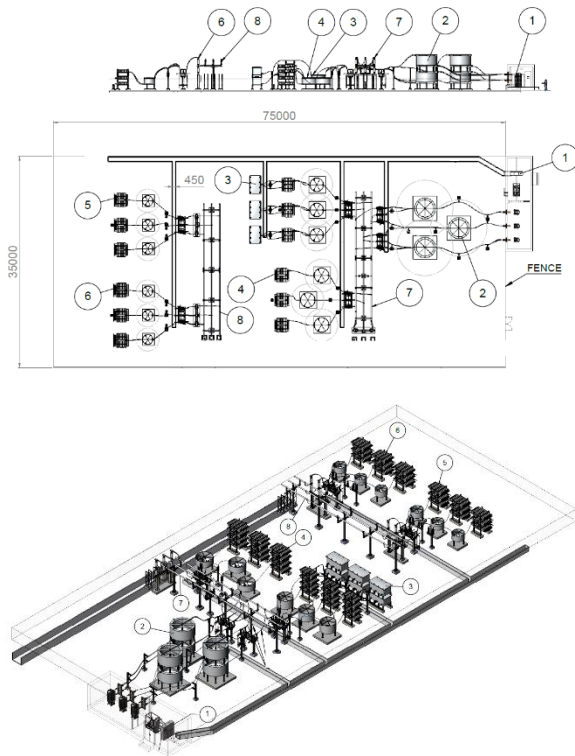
SVC layout. Components: 1 Thyristor valves and C&P, 2 TCR assembly, 3-6 filter capacitor banks, 7-8 busbar assembly.
